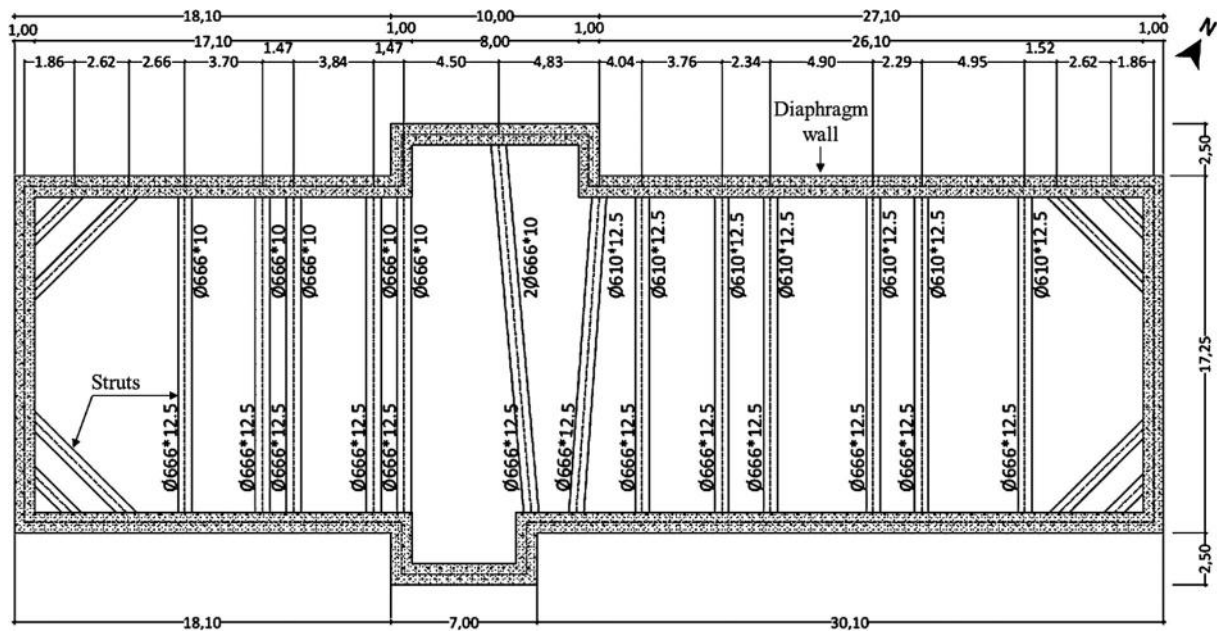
Plan view of the excavation at level -8.5 m and -13.1 m.
